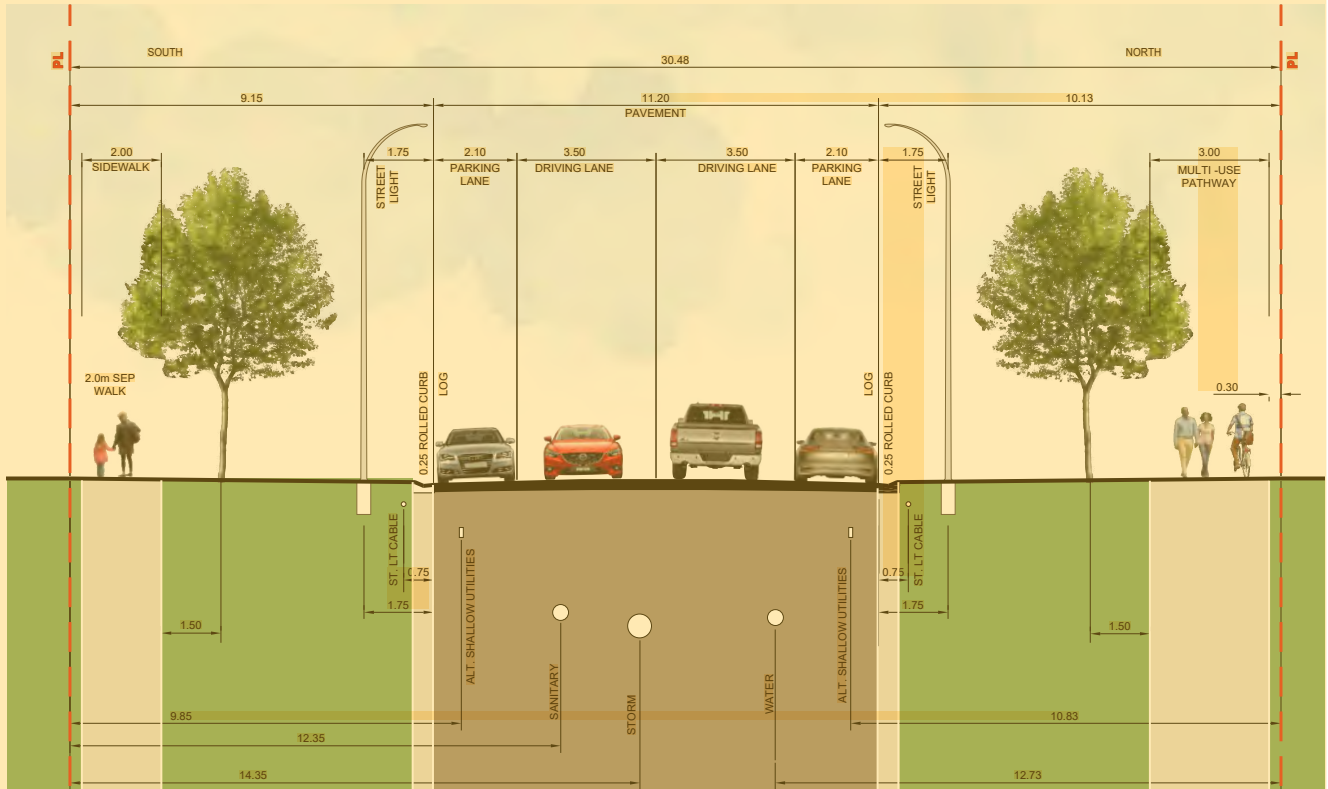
Cross-Section E-E – Modified Primary Collector Street (13.6 m/30.48 m ROW)
